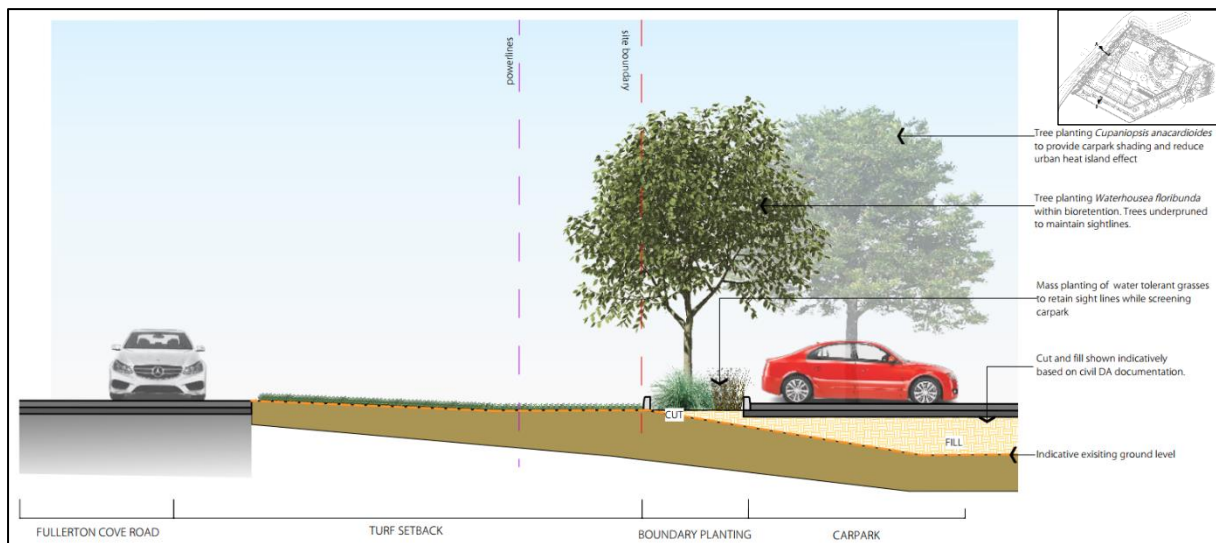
Section A Fullerton Cove Road (Prepared by *terras landscape architects* – L104 26/06/2024 - rev. J)
